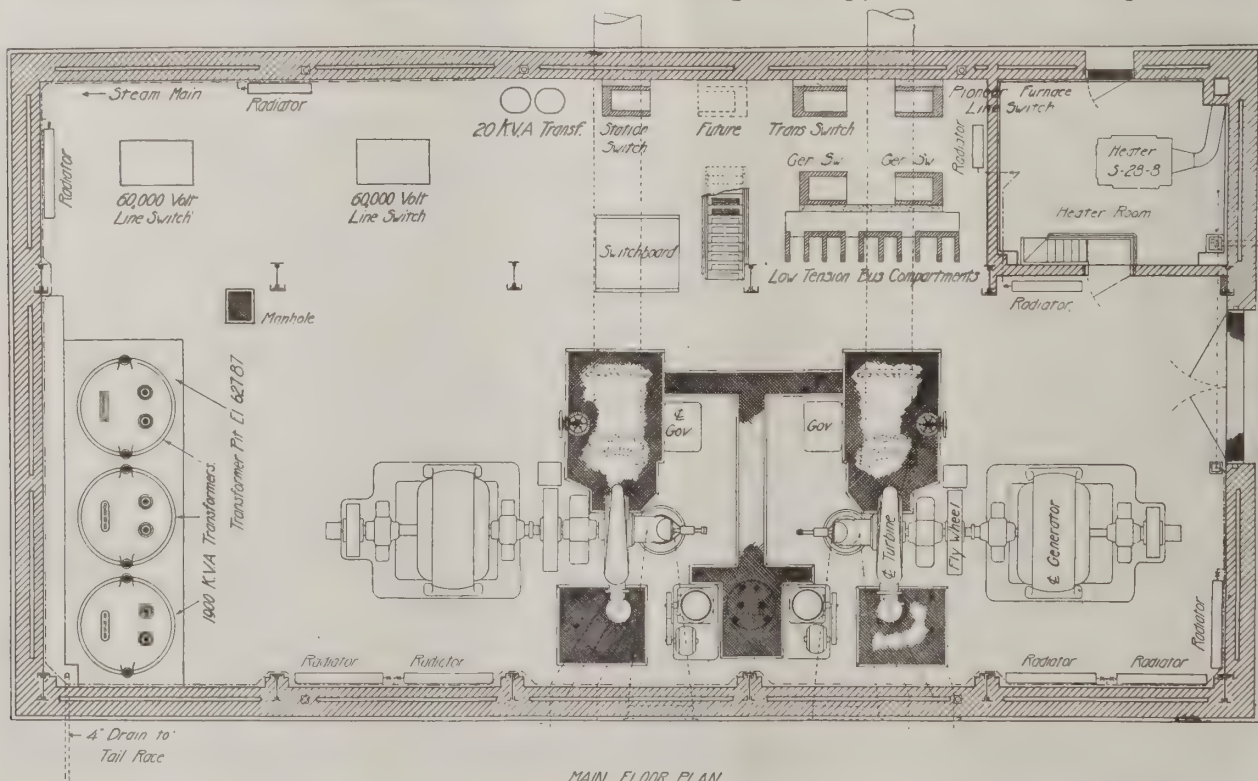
MAIN FLOOR PLAN CARP RIVER STATION.
